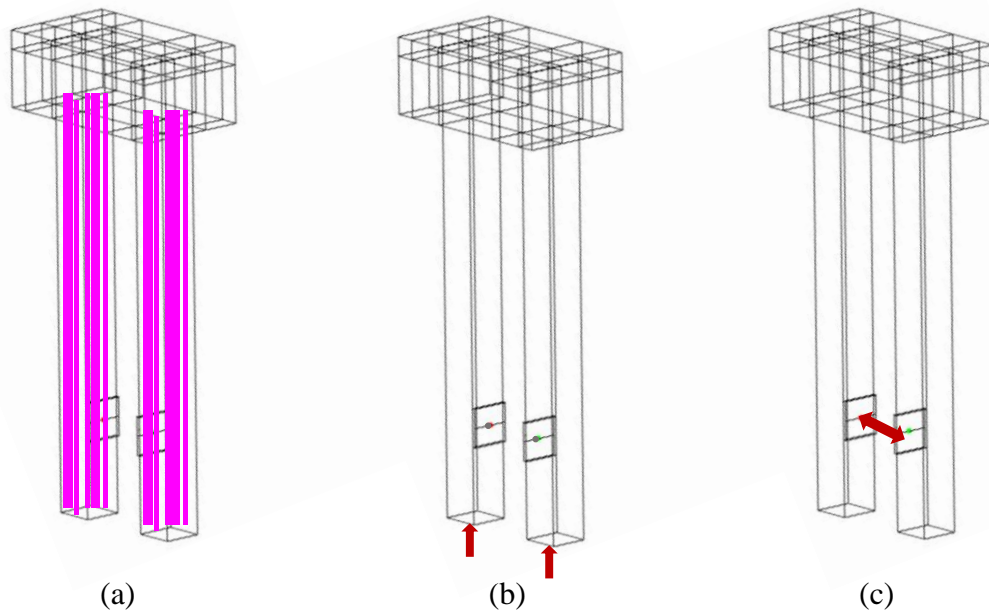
Load protocol (a) load stage #1 (b) load stage #2 (c) load stage #3
